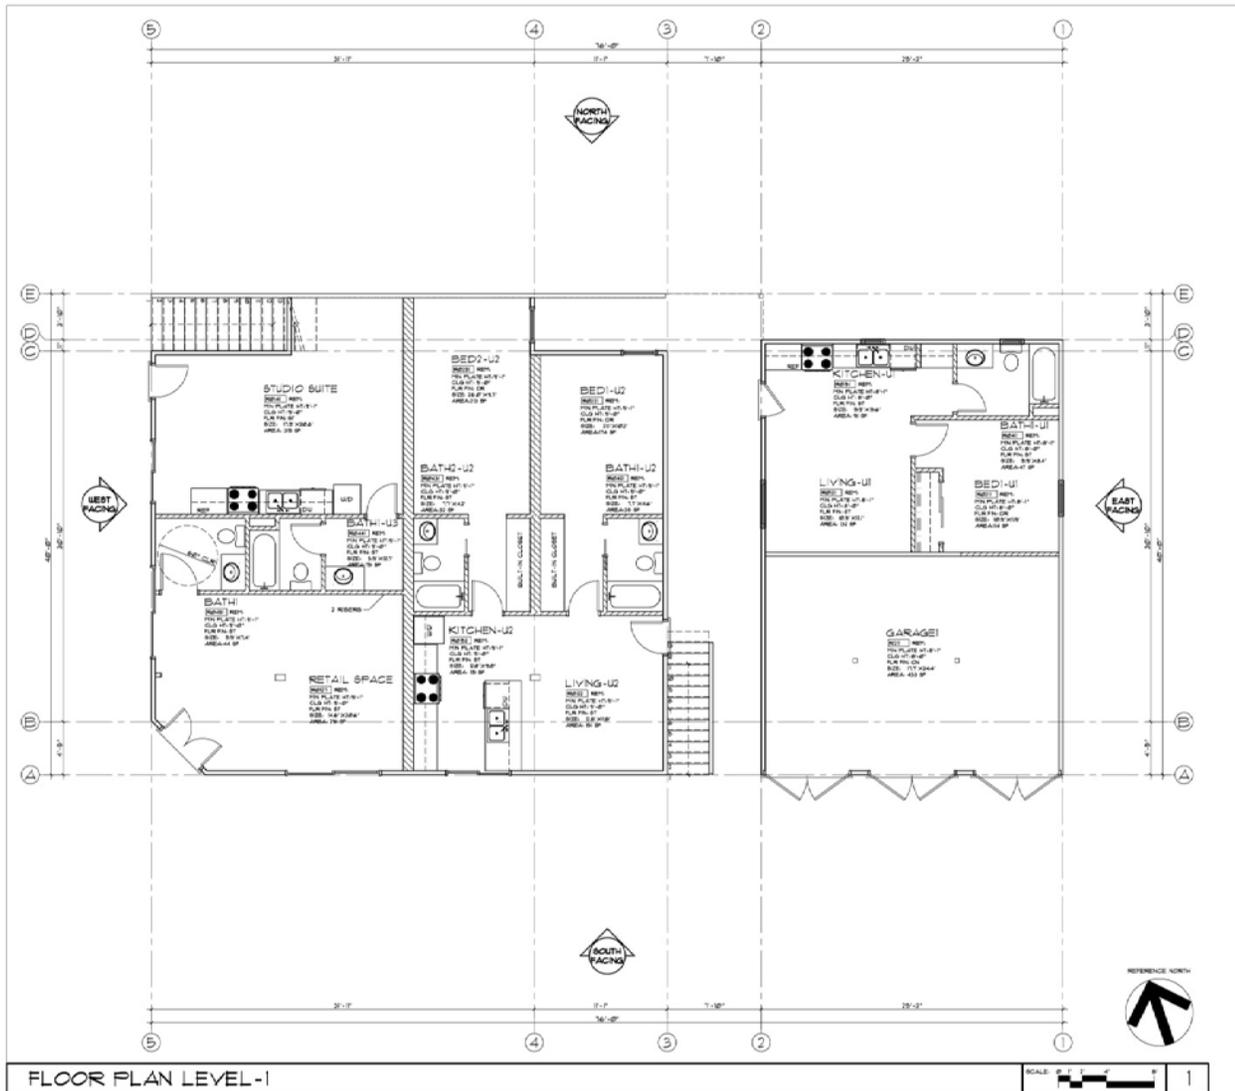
Exhibit B – Proposed Floor Plan 1<sup>st</sup> Floor
